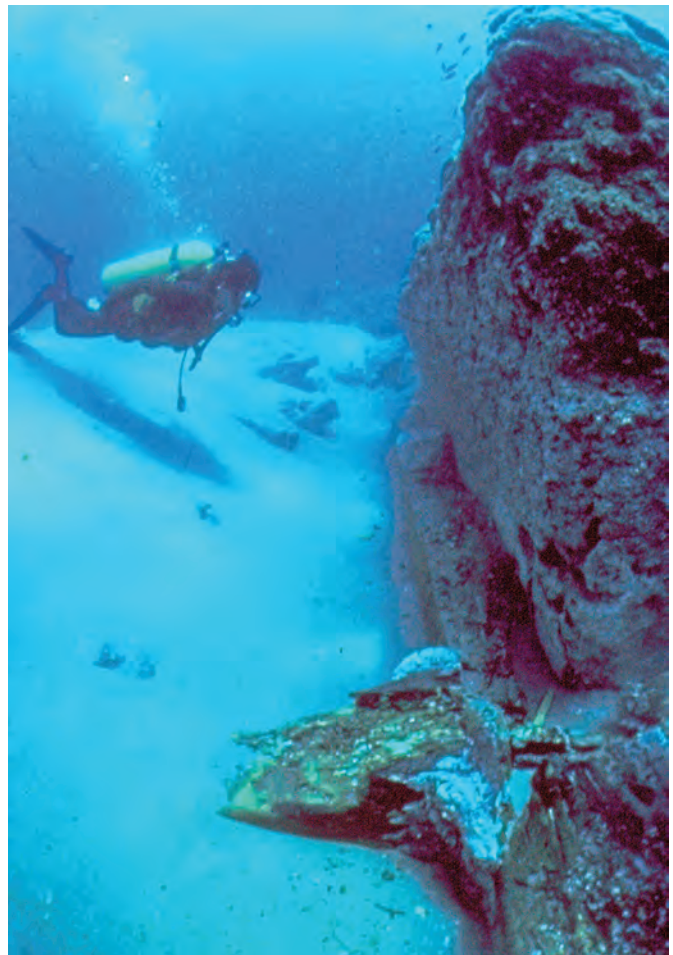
Sebastos, photo of concrete block and formwork in Area G.
